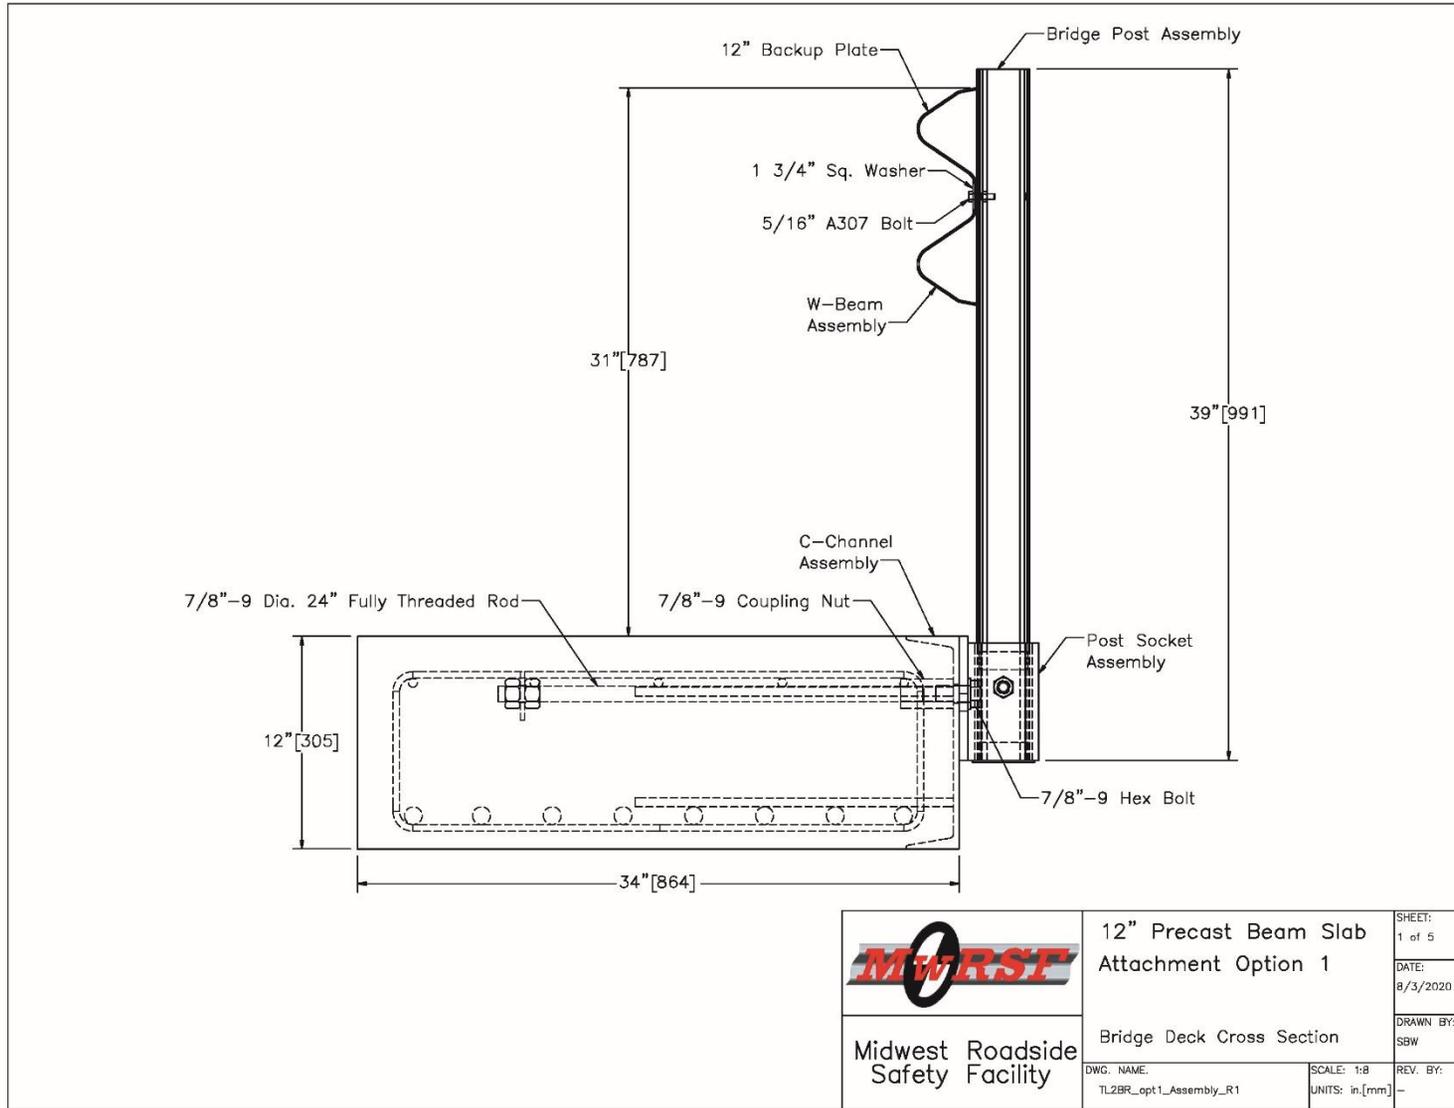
System Details, TL-2 Bridge Rail Attachment to 12-in. Deck, Option 1, Cross Section
